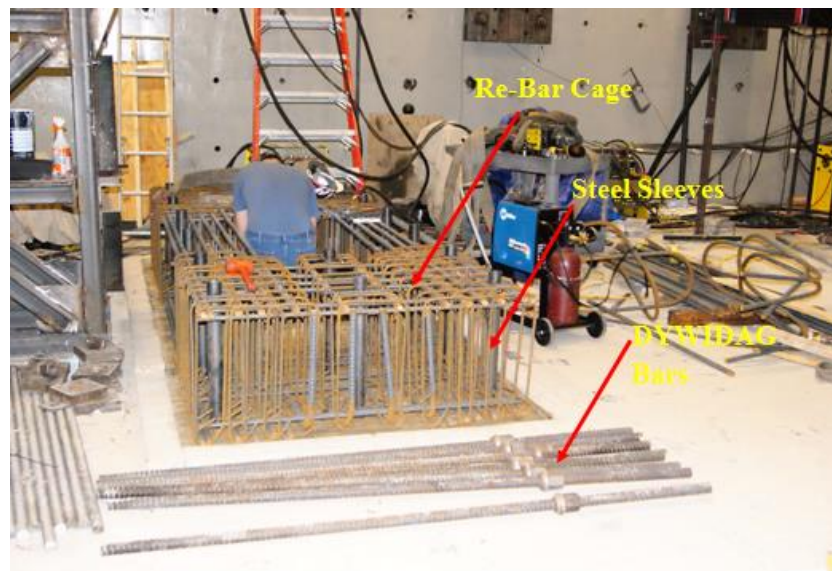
Welding Pipe Sleeves for the Steel Cage
